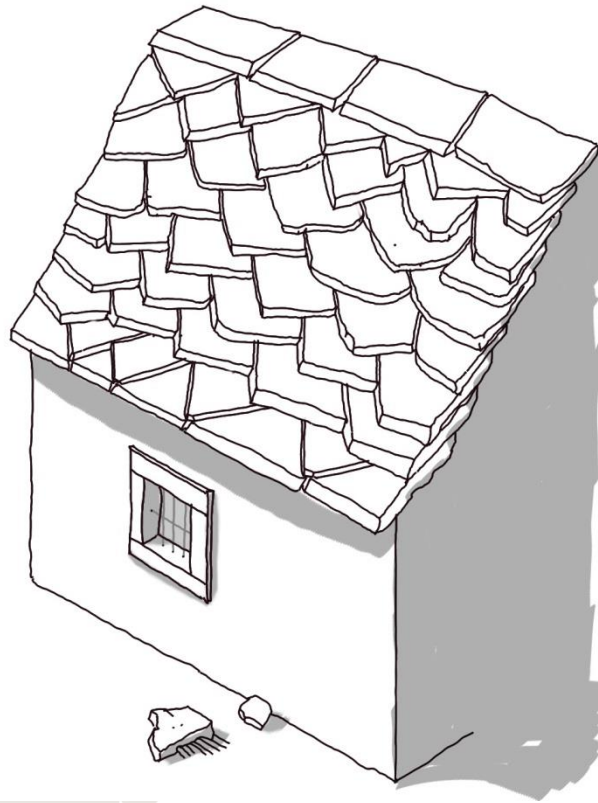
Sketch of roof cladding in Hercegovina and partly in Croatia. Roof plates are as much as 9 cm thick, layered in several layers. The stones are rotated (45°). Rain water flows down the corner edges.
